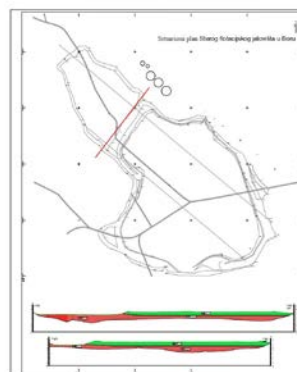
Situational plan of the old tailings pit with longitudinal profiles.
